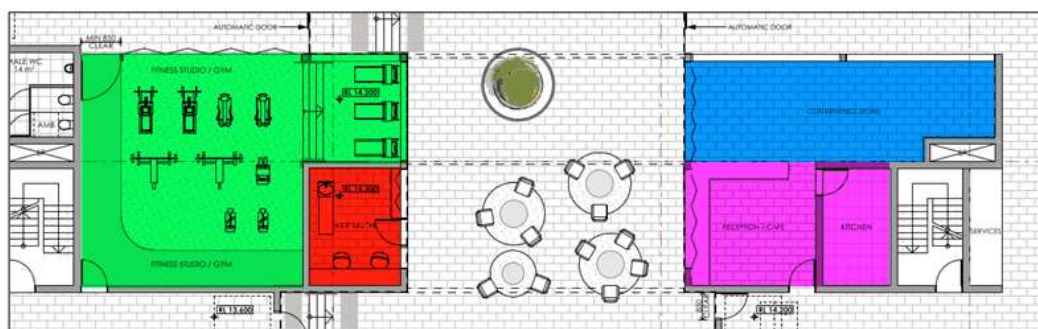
Extract of Ground Floor Plan showing Gym (Green), Hair Salon (Red), Convenience Store (Blue), Cafe (Pink)
